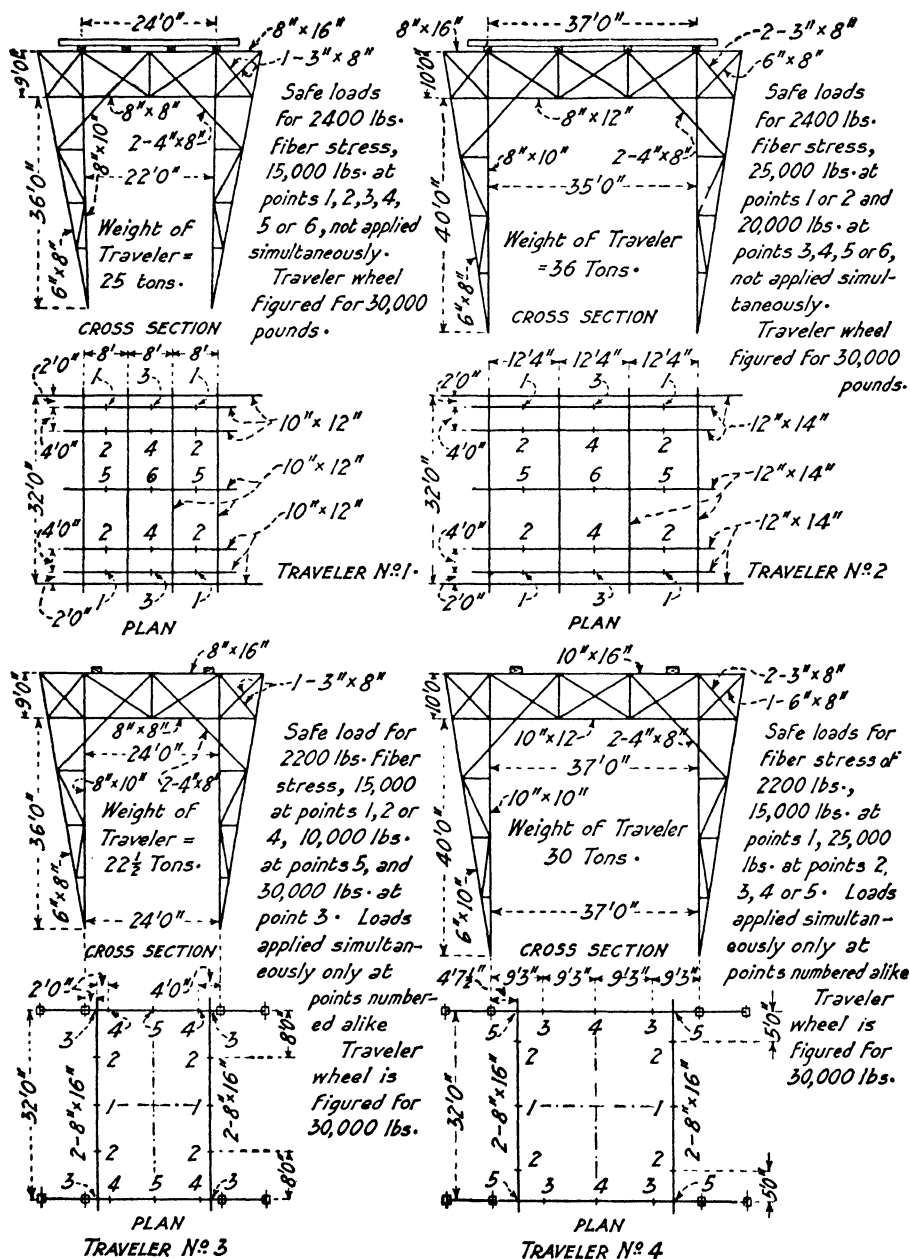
STANDARD TIMBER TRAVELERS. AMERICAN BRIDGE COMPANY.
